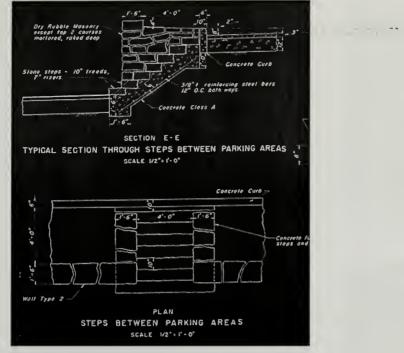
Stone steps at the Sand Beach parking lot. (U.S. Department of Commerce, Bureau of Public Roads, Project 43A1, Sheet 6 of 23, February 1953)
